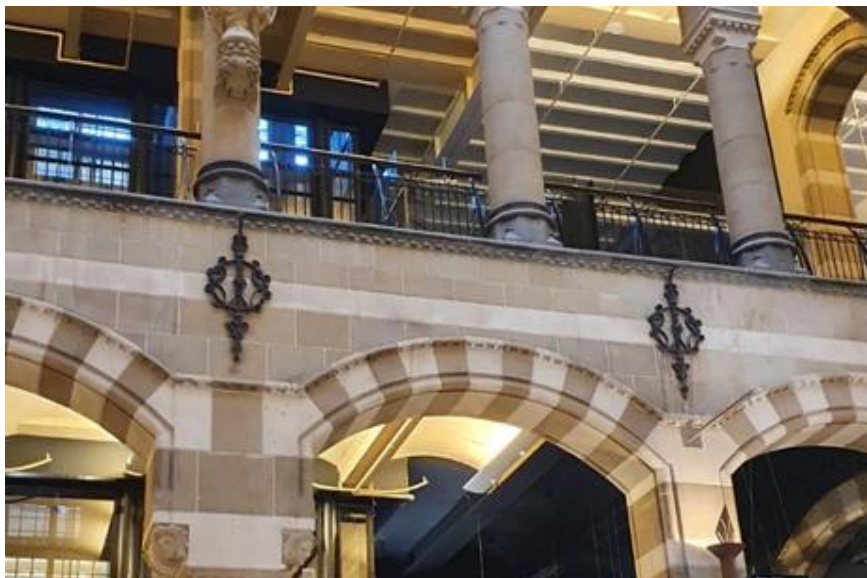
Anchoring elements at floor level - Holland historical building (19th century)
